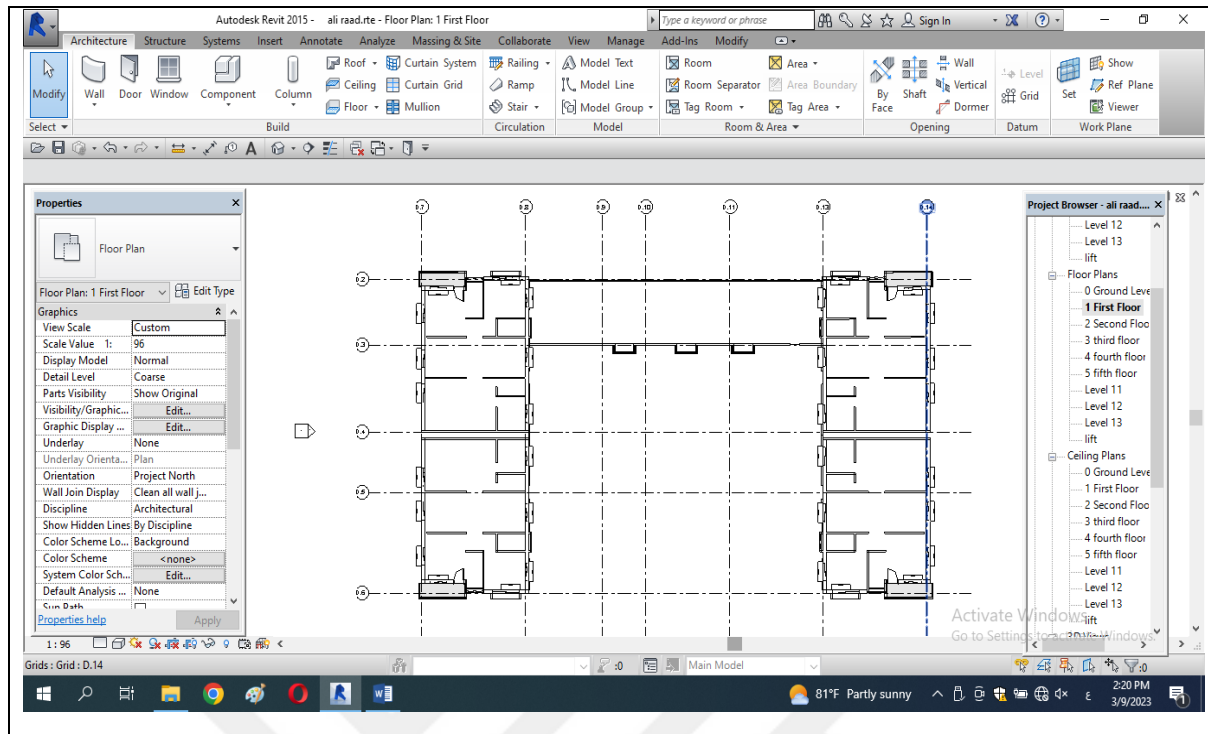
Building The Walls Of The First Floor and Specify The Building Levels.
